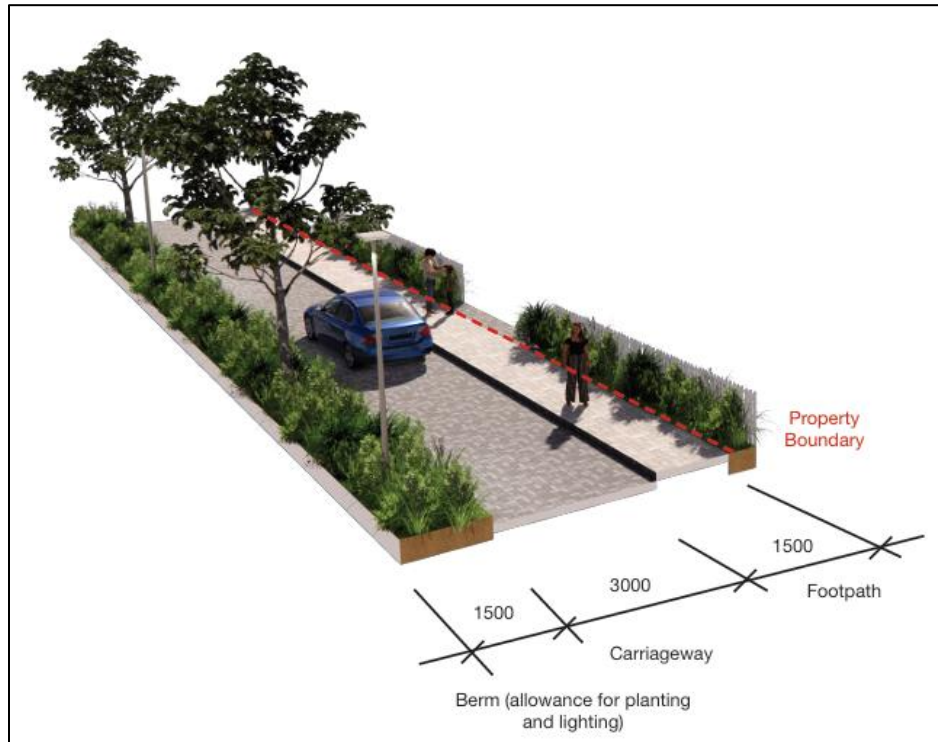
6m Legal width JOAL - cross section (JOAL serving 6 or more lots)
